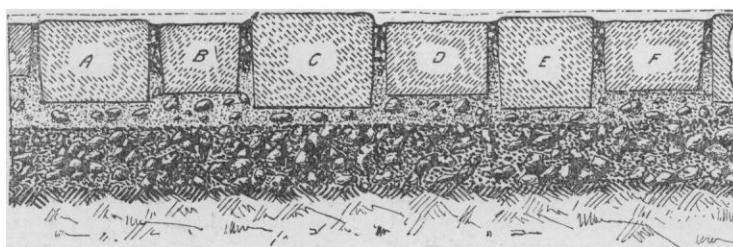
PAVEMENT AFTER HEAVY TRAFFIC.
